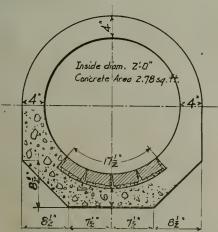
FIG. I. PLAIN CONCRETE SEWER, PORTLAND, ORE.
